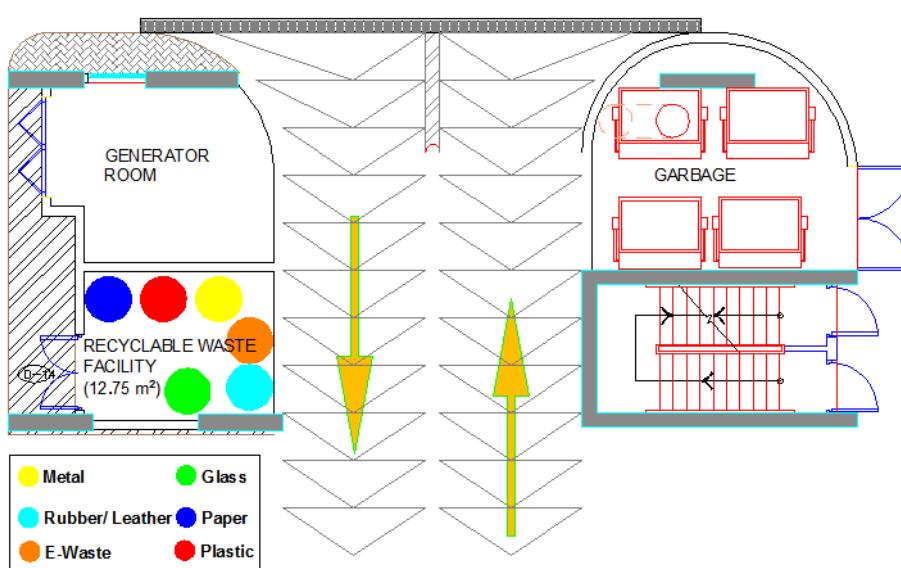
(2): Separate Recyclable Waste Facility (Example)
